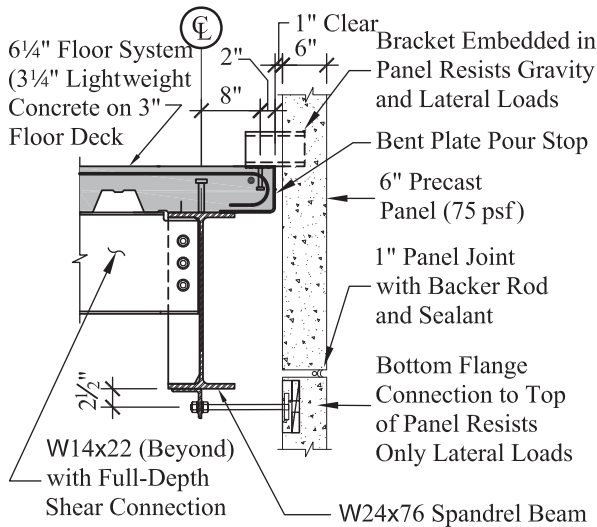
Section of floor spandrel beam with precast panel supported on slab.
